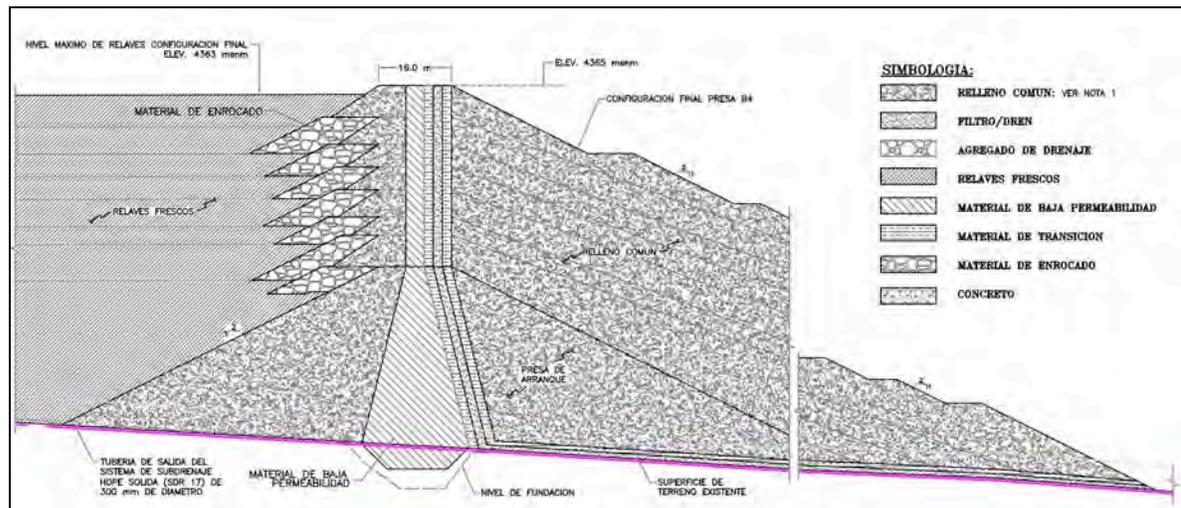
B4 Dam – Cross Section (Knight Piésold, 2016).
